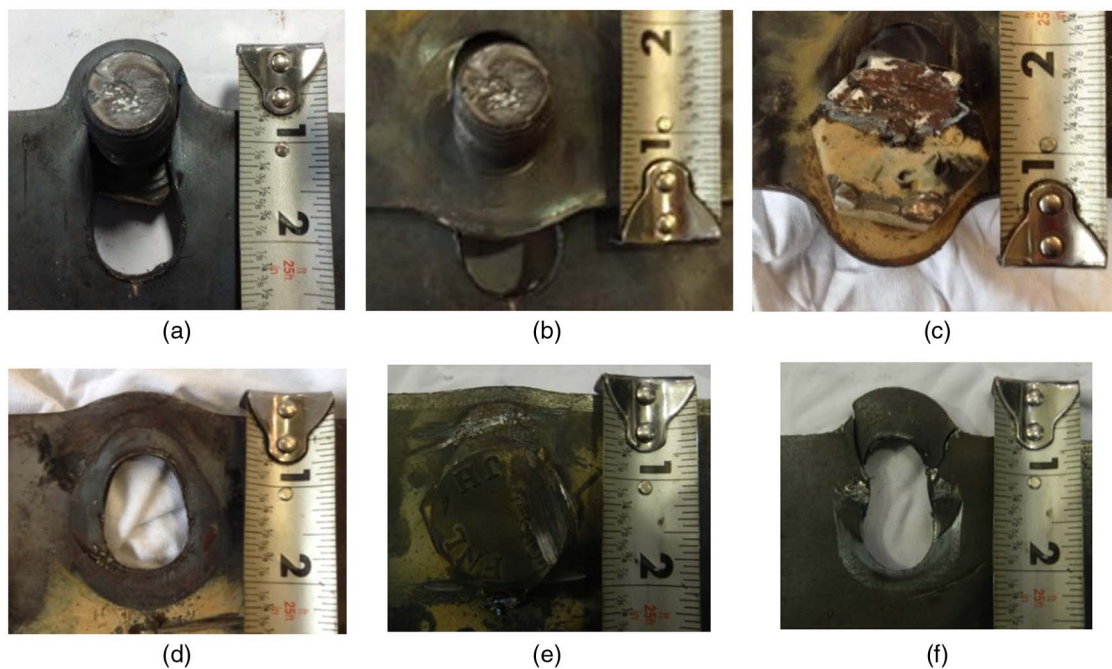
Lap-splice joints after testing for plate bearing failure mode: (a) Specimen PB-4, Plate 1; (b) Specimen PB-4, Plate 2; (c) Specimen PB-5, Plate 1; (d) Specimen PB-5, Plate 2; (e) Specimen PB-4, Plate 1; (f) Specimen PB-6, Plate 2
